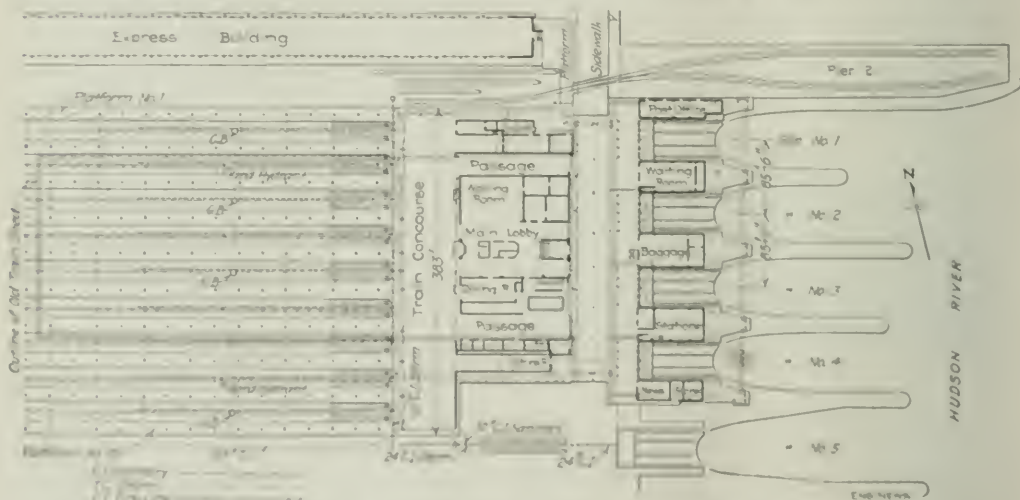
GENERAL LAYOUT OF FERRY HOUSE, NEW STATION AND TRAIN SHED
